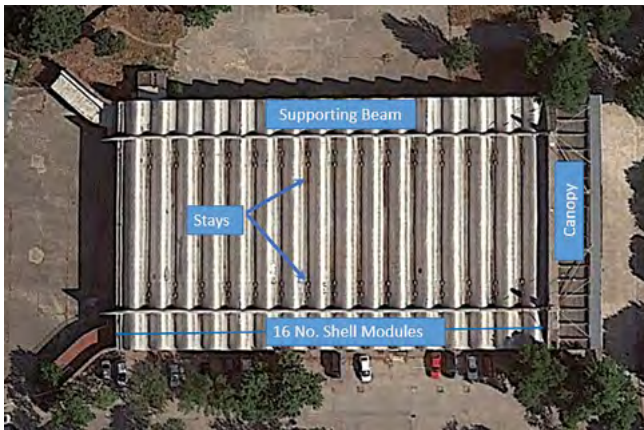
Aerial view of Pavilion roof. Google Earth ©.
